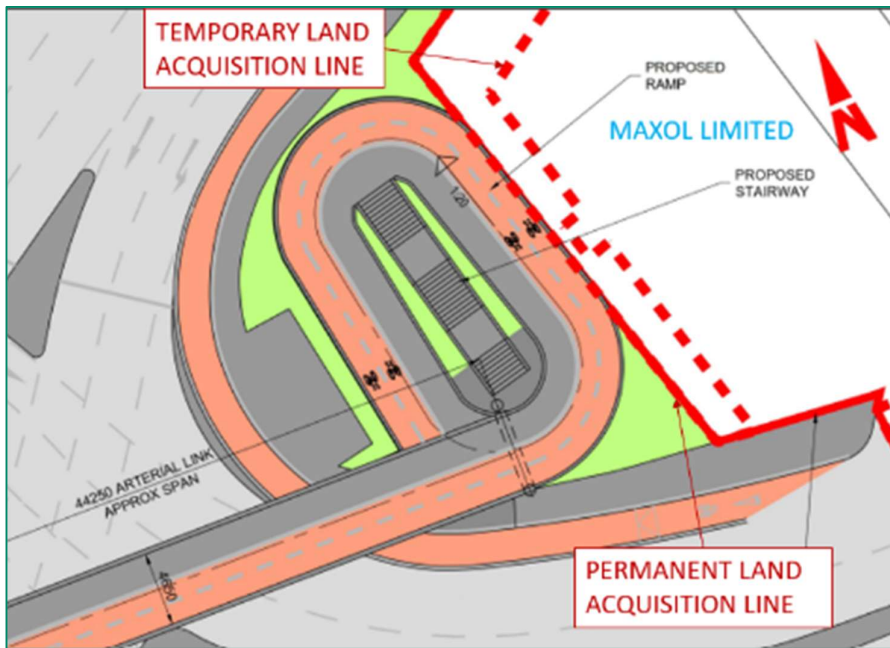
Extract from Drawing of ST02 Naas Road Pedestrian and Cycle Bridge Plan Proposed, showing the curved ramp adjacent to Maxol Limited
